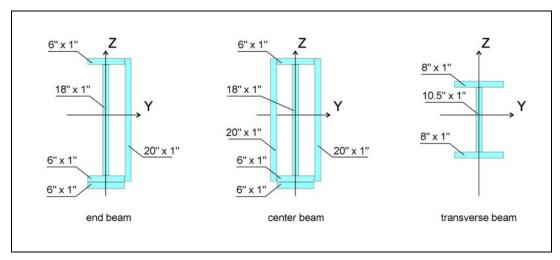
Expansion Joint Model – Three-Beam Transition System Element Cross-Sections – Dimensions in Inches.
